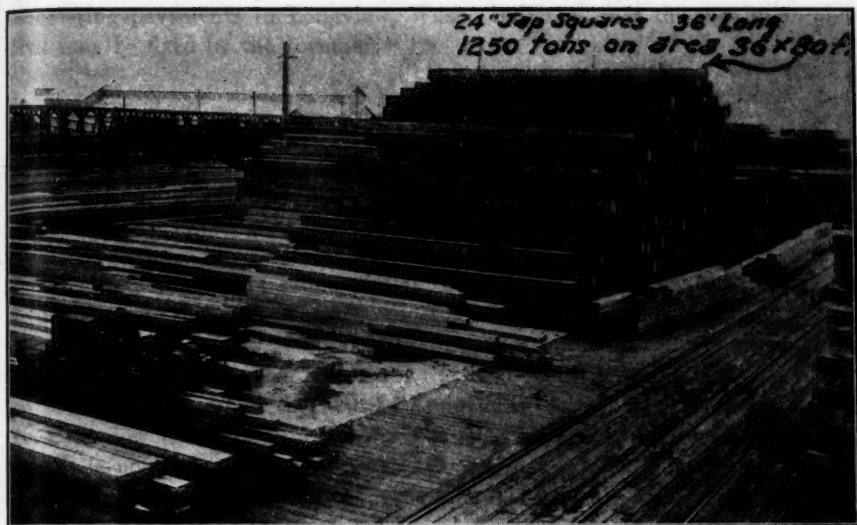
VIEW OF HEAVY STORAGE OF LUMBER ON HEXAGONAL SLAB PAVEMENT, LONG-BELL LUMBER CO., LONGVIEW, WASH.
